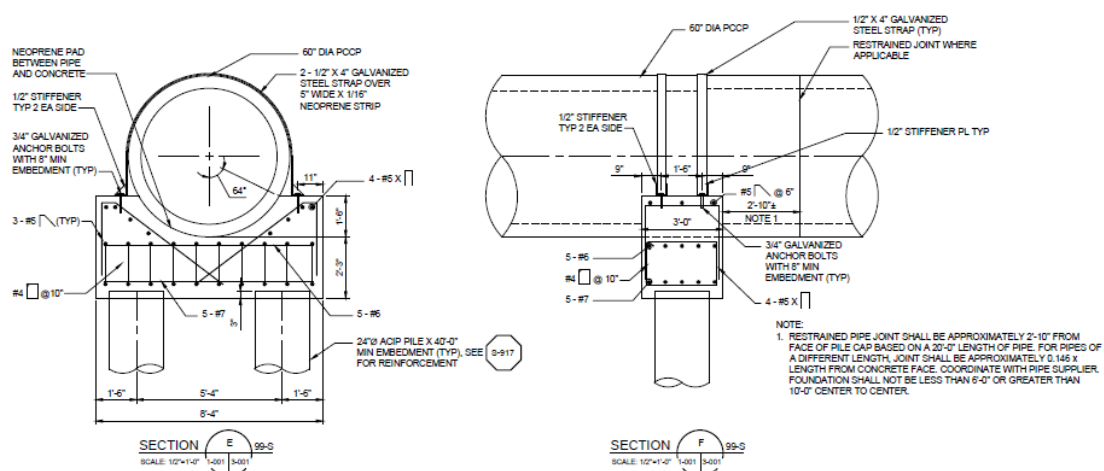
PCCP Secondary Effluent Conduit Foundation Detail
